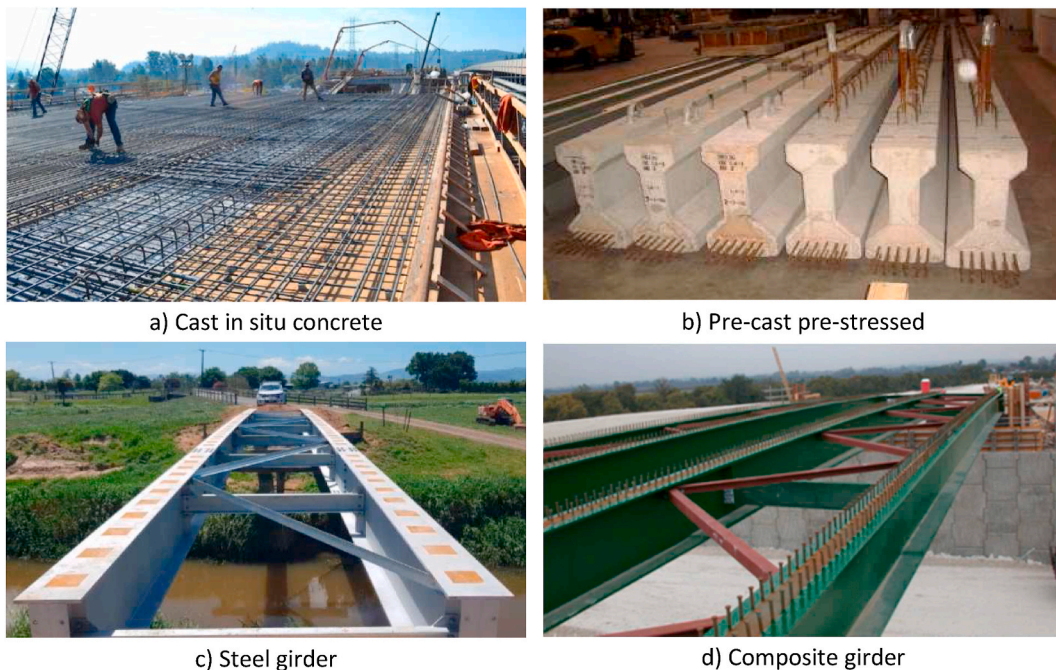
Commonly used materials in superstructure systems for highway bridges: a) Cast in situ concrete, b) Pre-cast pre-stressed, c) Steel girder, and d) Composite girder.
